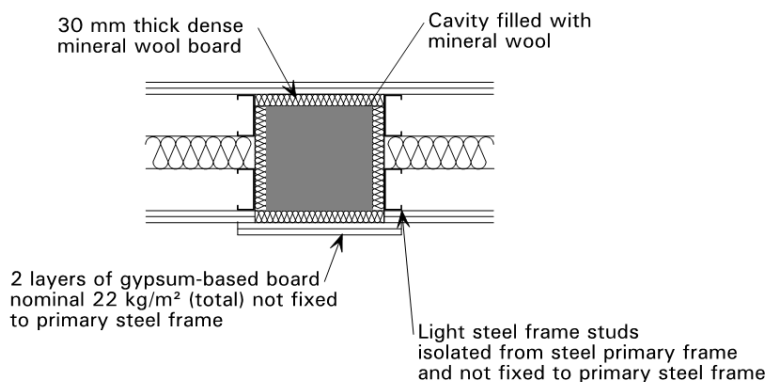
Indicative Structural Column Integration Detailing (Plan View)
